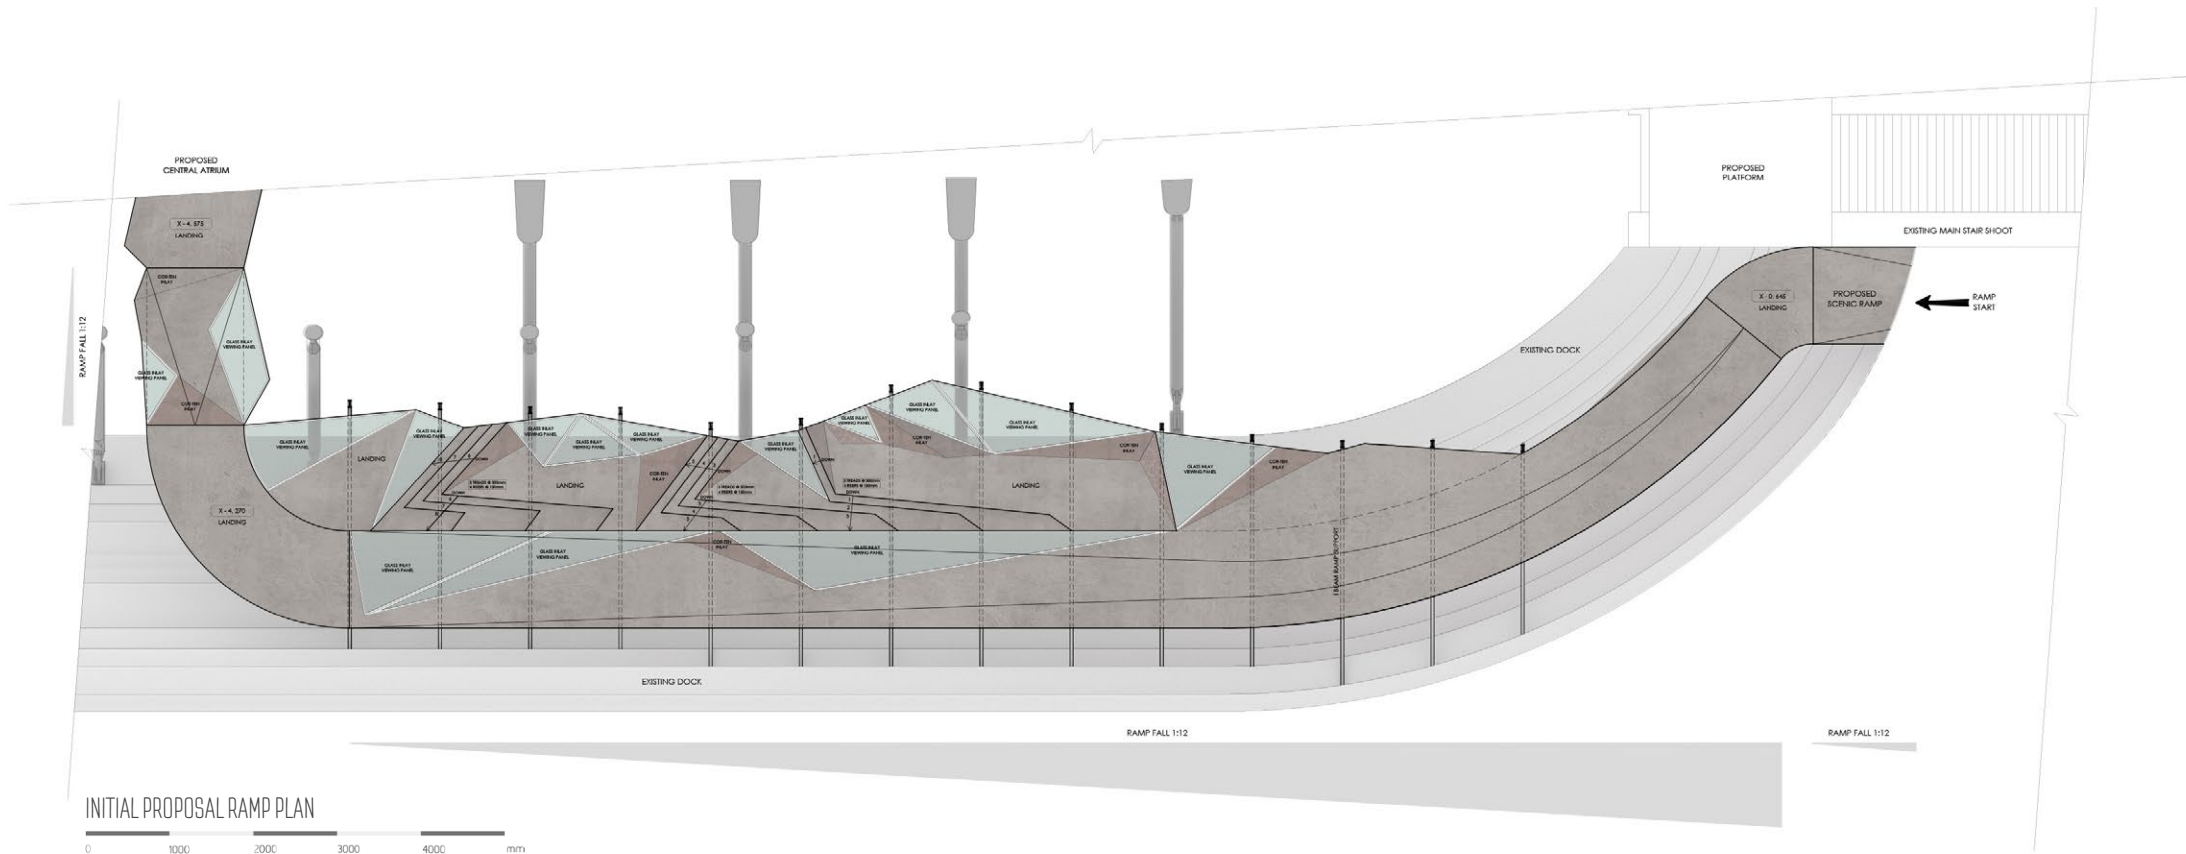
Initial Layout of Proposed Scenic Ramp (Author, 2016)
